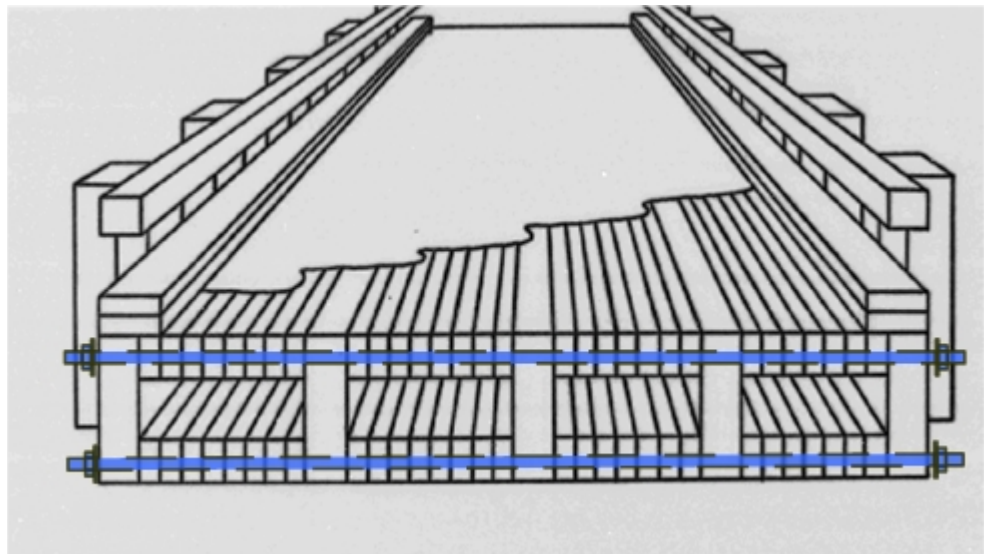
Typical Section of a Stress-Laminated Timber Box Beam (Source: Barry Dickson, West Virginia University)
